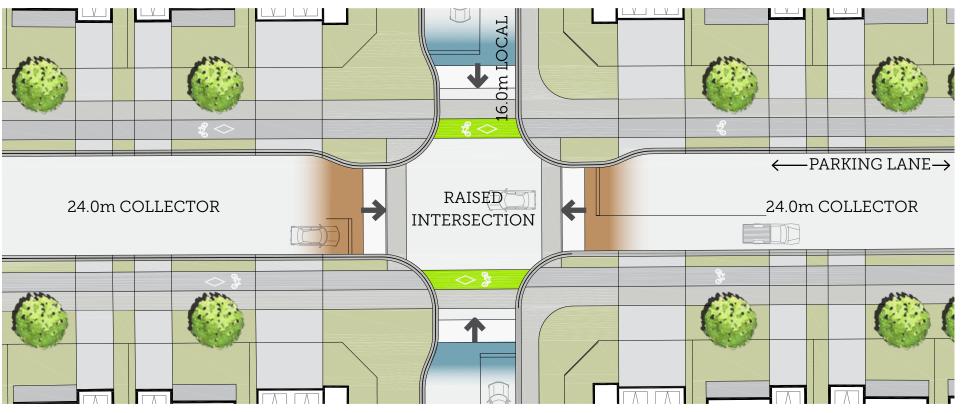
Convergence of 24.0m Collector Road with 16.0m Local Road at Raised Intersection
